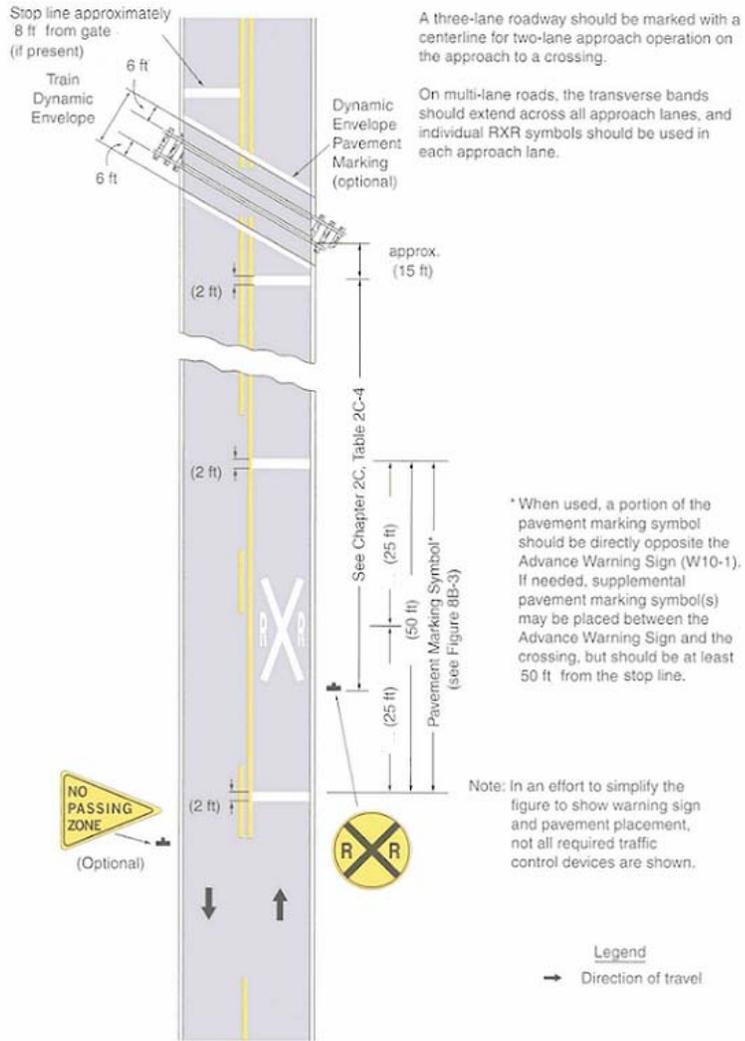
Example Placement of Warning Signs and Pavement Markings at Railroad-Highway Grade Crossings [Source: MUTCD 2003, Figure 8B-6, page 8B-11] [See next page for alternative (narrow) pavement markings]
